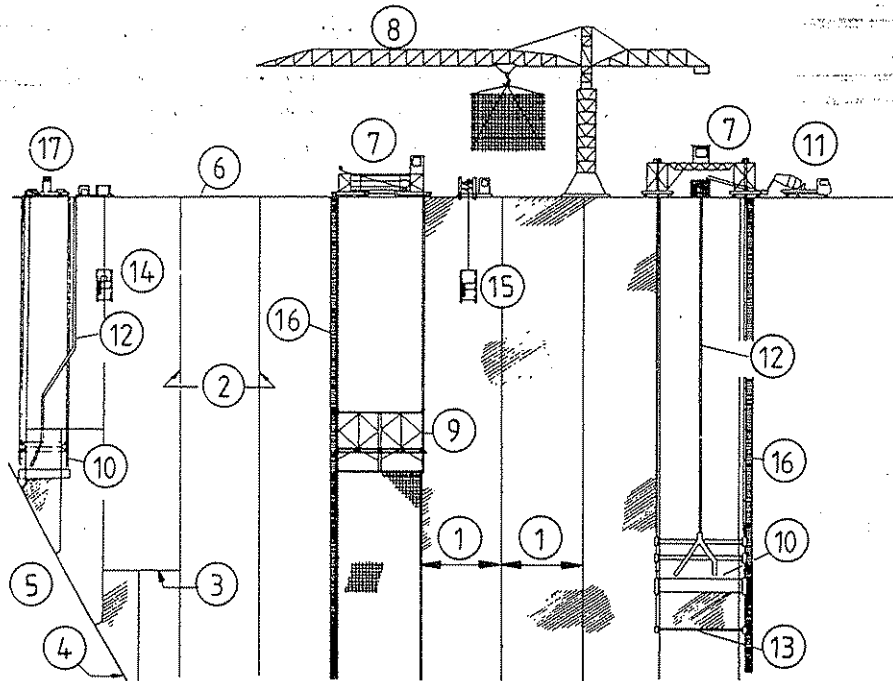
Concrete face sealing. Typical arrangement of construction equipment (adapted from Varty et al. 1985 and Fell et al. 1992).
